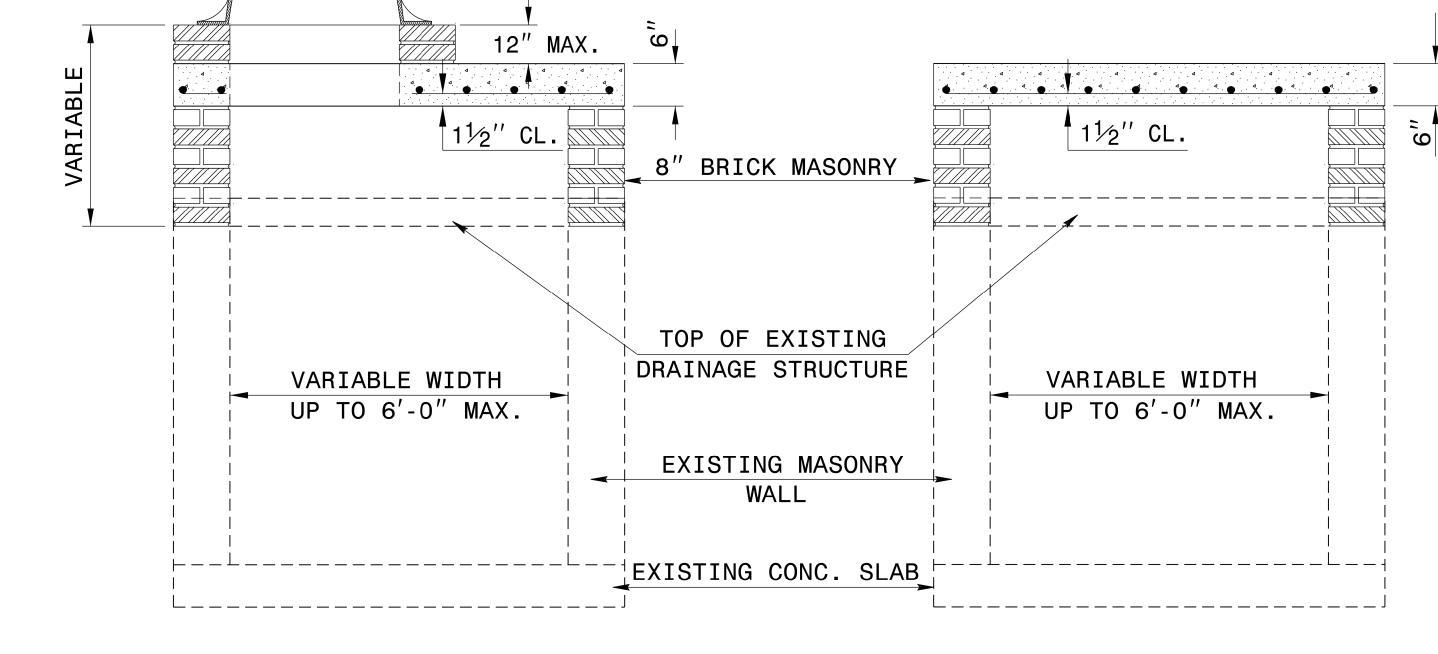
DETAIL INTENDED FOR NON-TRAFFIC BEARING DRAINAGE STRUCTURES.
